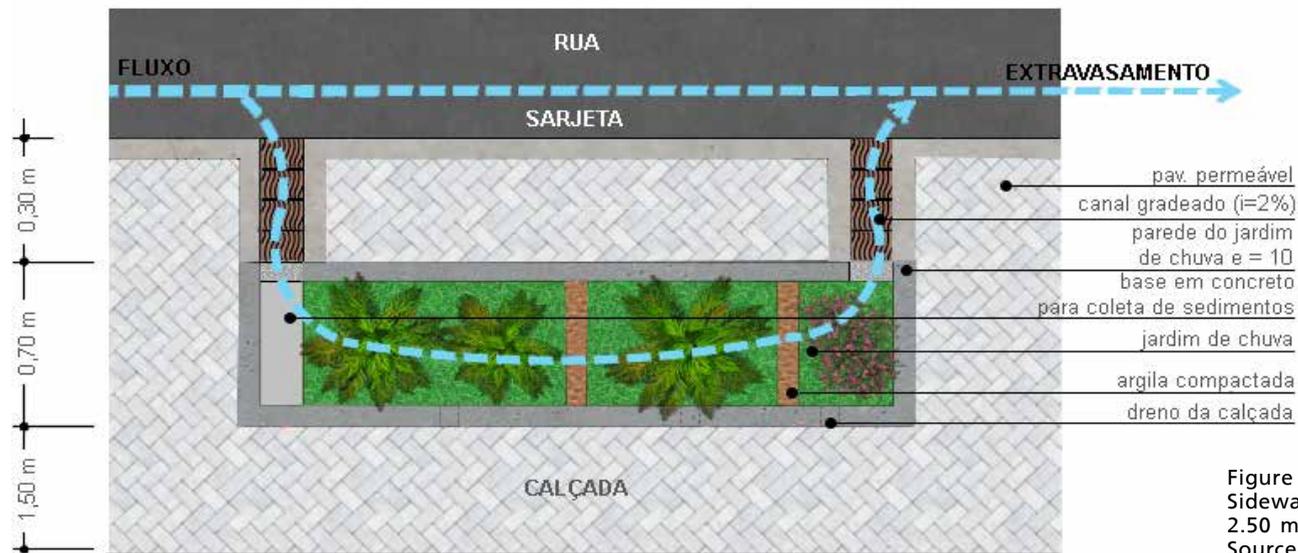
Project Model for Extending Sidewalks 2 and 3 - Example for sidewalks 2.50 m wide
